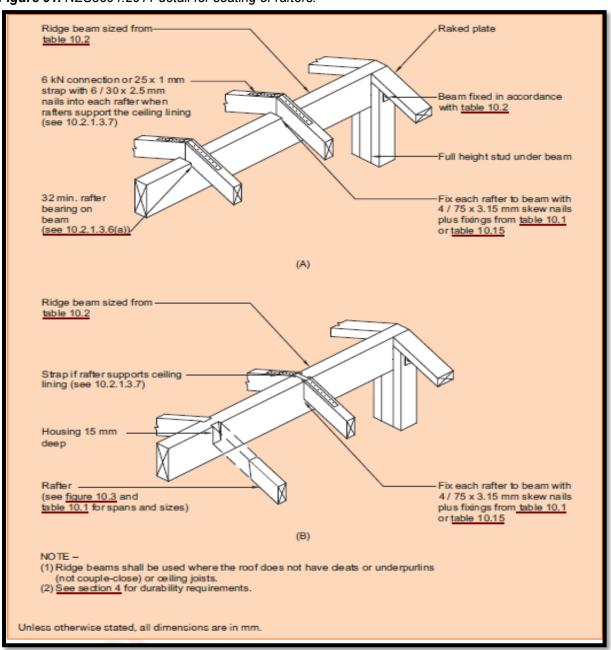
NZS3604:2011 detail for ridge beam connections for rafters.
